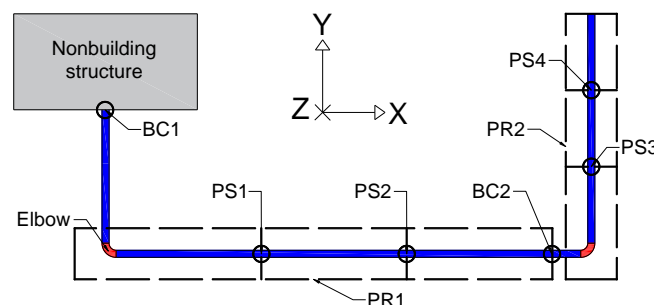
Flexibility/rigidity of pipelines connection with a pipe rack or adjacent structures
